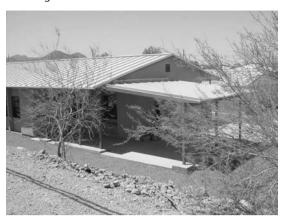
Completed straw bale residence with roof overhang to shade south windows.
